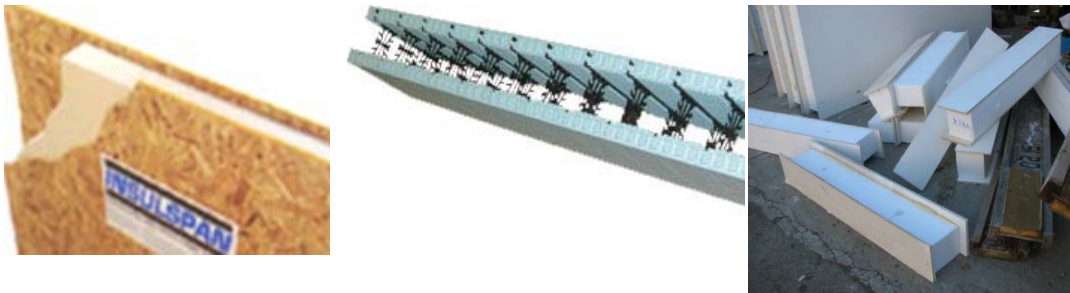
Structural Insulated Panels (SIP), Insulated Concrete Forms (ICF) and Structural Foam Panels
